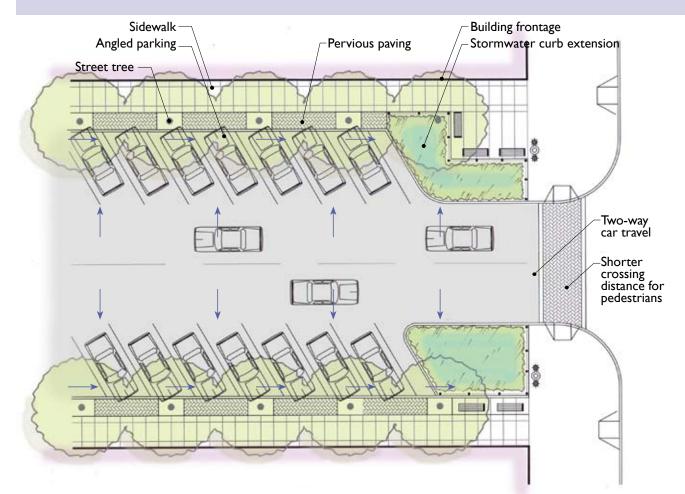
Angled Parking Curb Extensions-Plan ViewView
